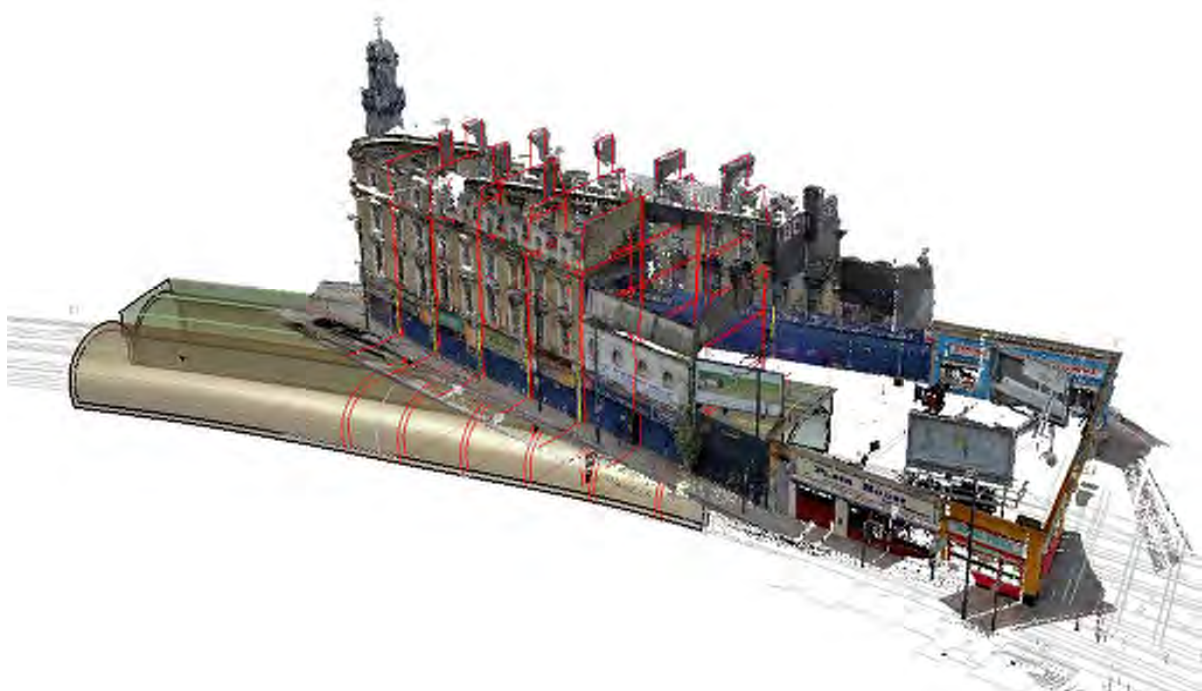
Plot of laser scan and geometric tunnel model showing arrangement of tunnels and cross walls
